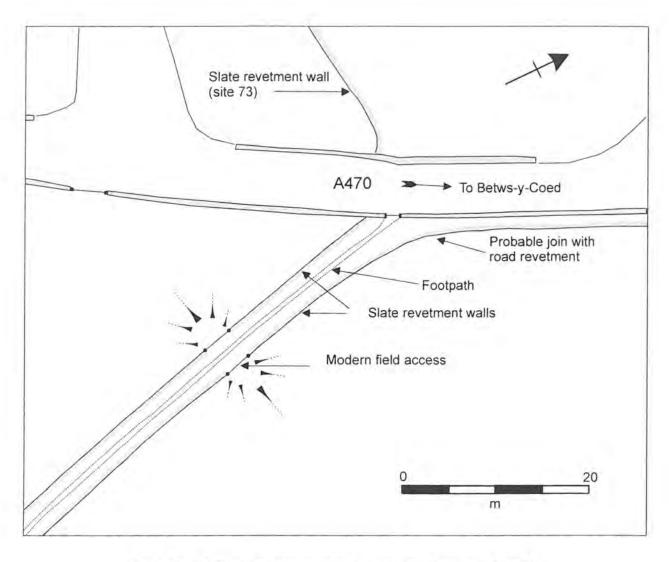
Site 74, Tramway converted to footpath and location of site 73
